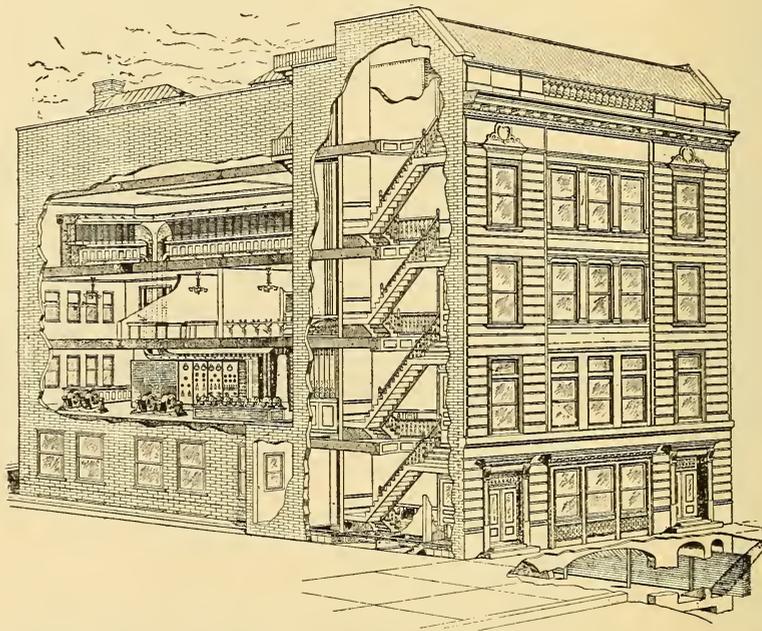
PLAZA CENTRAL OFFICE BUILDING.
